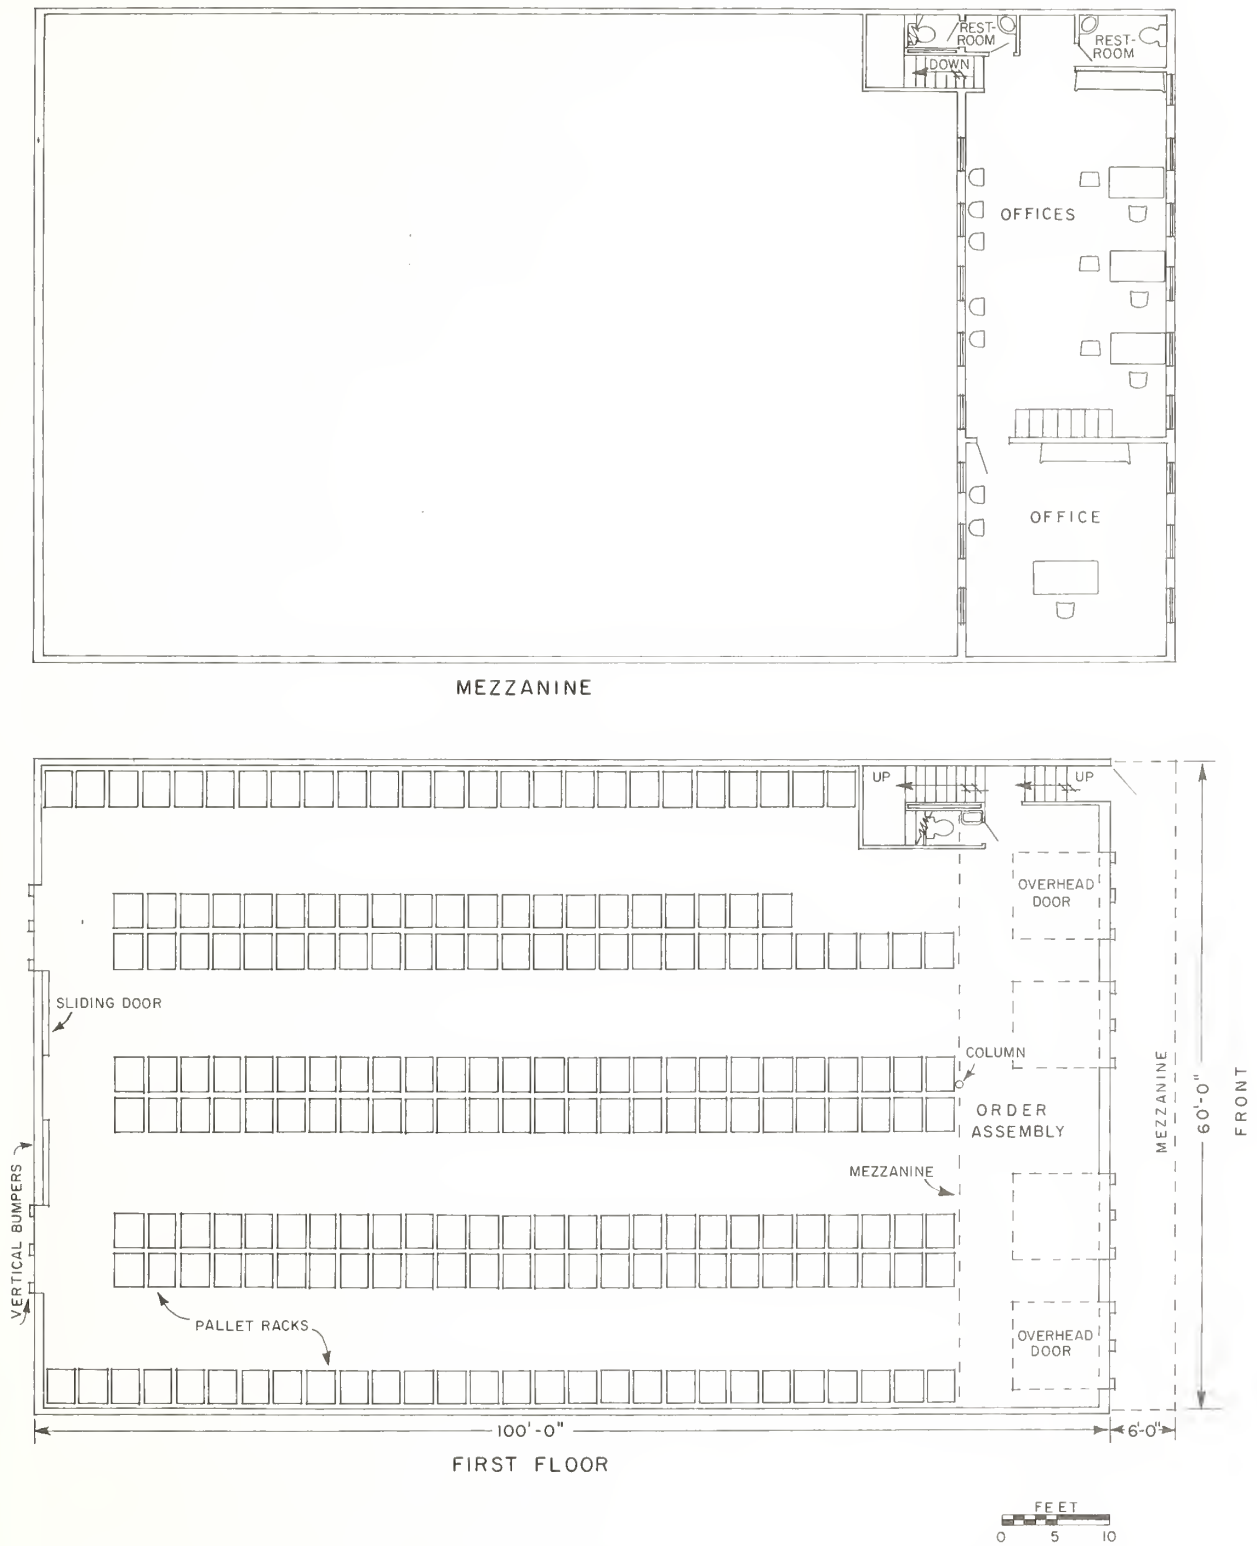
Layout of a grocery firm in two multiple-occupancy building units.
